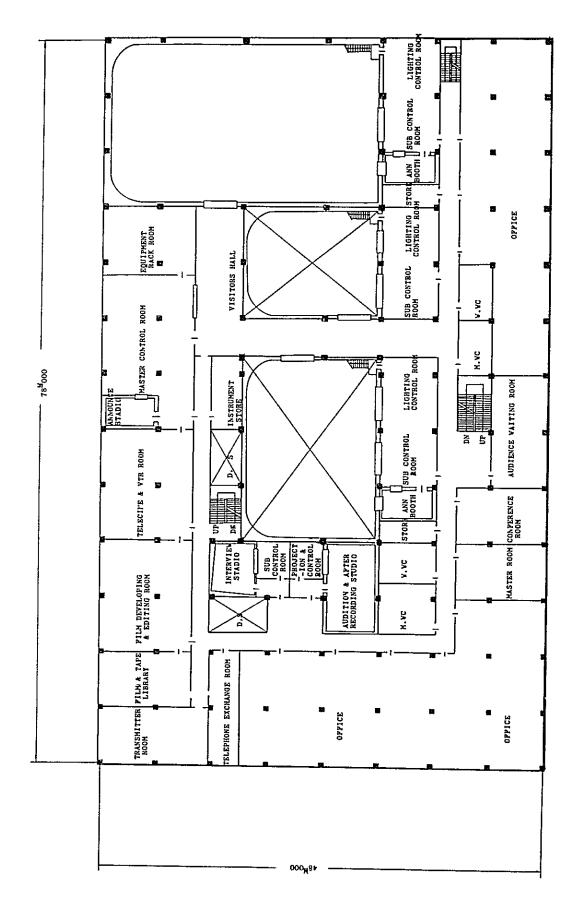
FLOOR LAYOUT OF BANGKOK CENTRAL STATION
